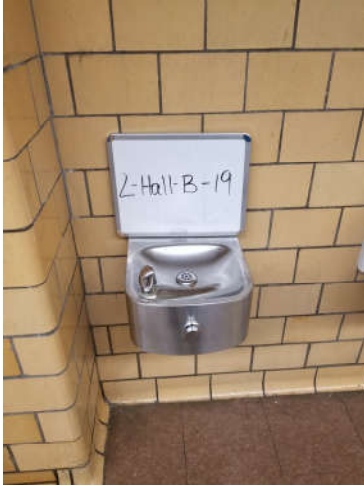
Bubbler, located on the 2nd floor next to room 206.
